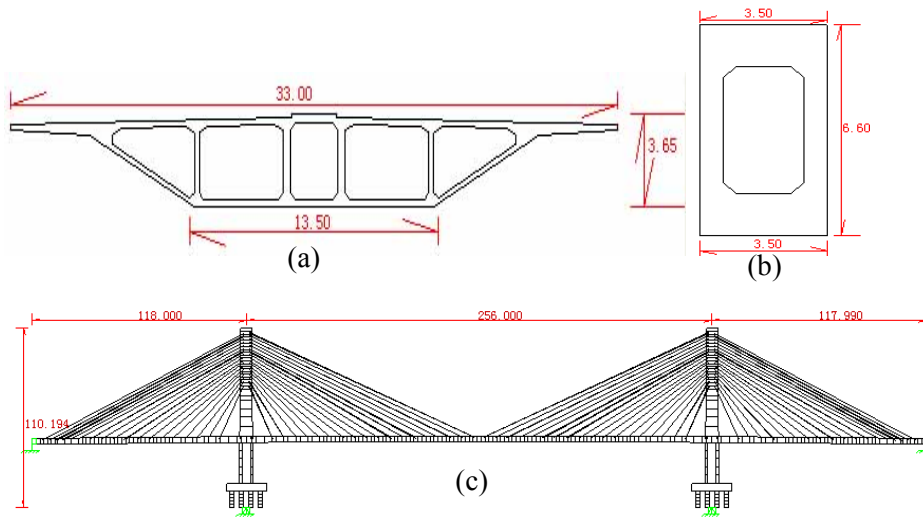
, Deck Section (a), pylon section (b) and span arrangement(c) of mountain Lu Bridge
